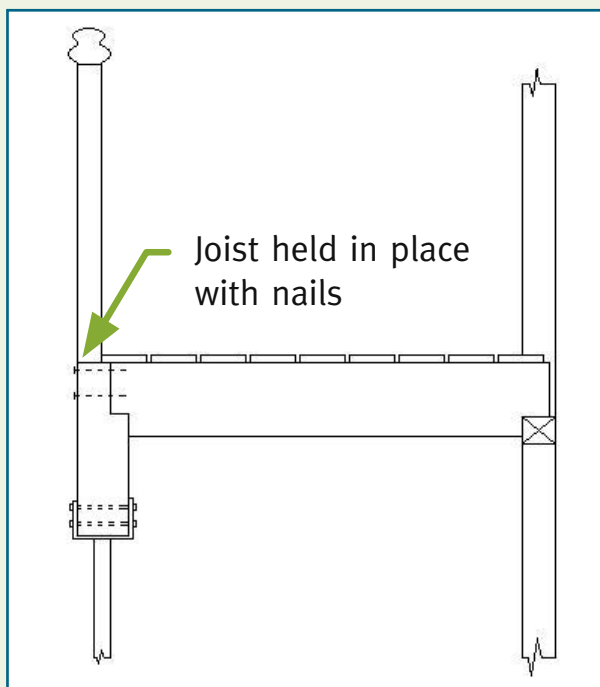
Pre-1940s deck construction with a cogged out beam holding the joist with nails
